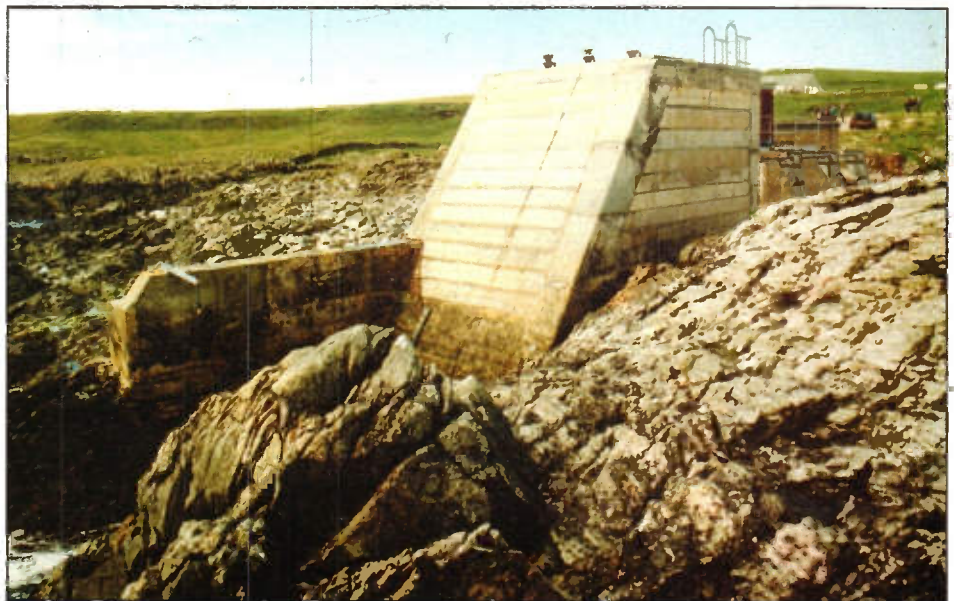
Main concrete construction of the enclosed concrete wave chamber of the original Islay system. (Courtesy ETSU)
